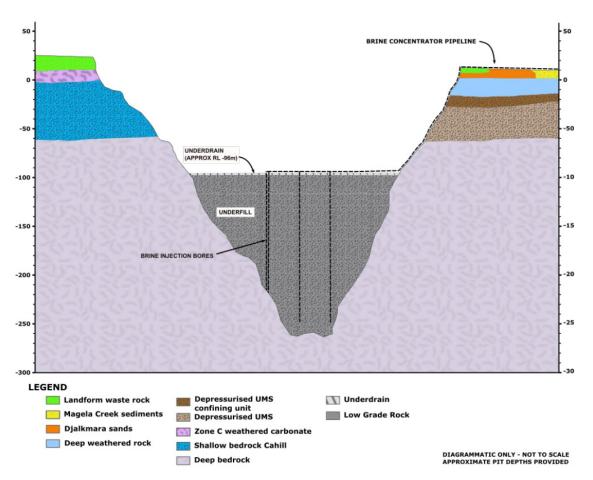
Schematic cross-section of Pit 3 before tailings deposition commenced
